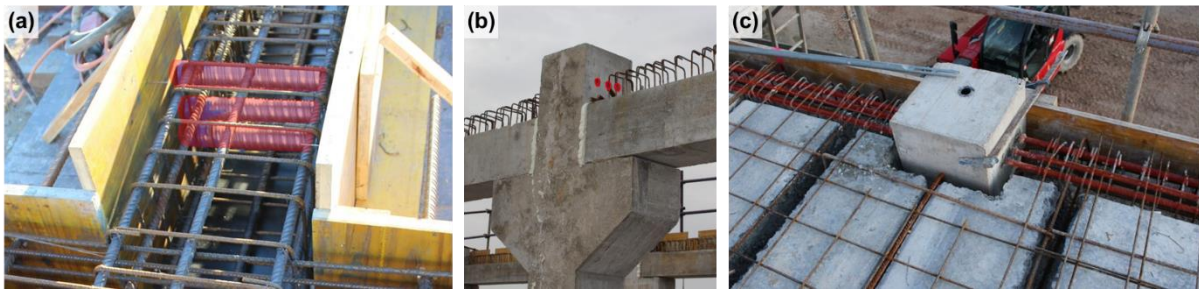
(a) Sleeves for continuous ties in edge column prior to casting; (b) Precast edge column in position prior to placing continuous ties through sleeves; (c) Edge column with continuous ties passing through it prior to casting topping layer (All photos courtesy of Manuel Buitrago).
